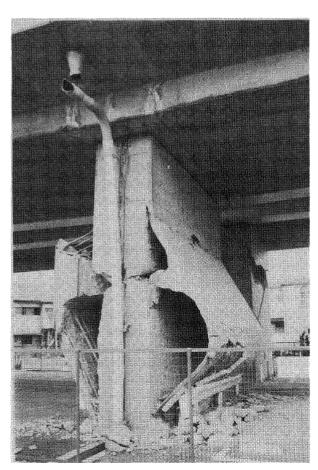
Meishin Expressway Pier Damage
